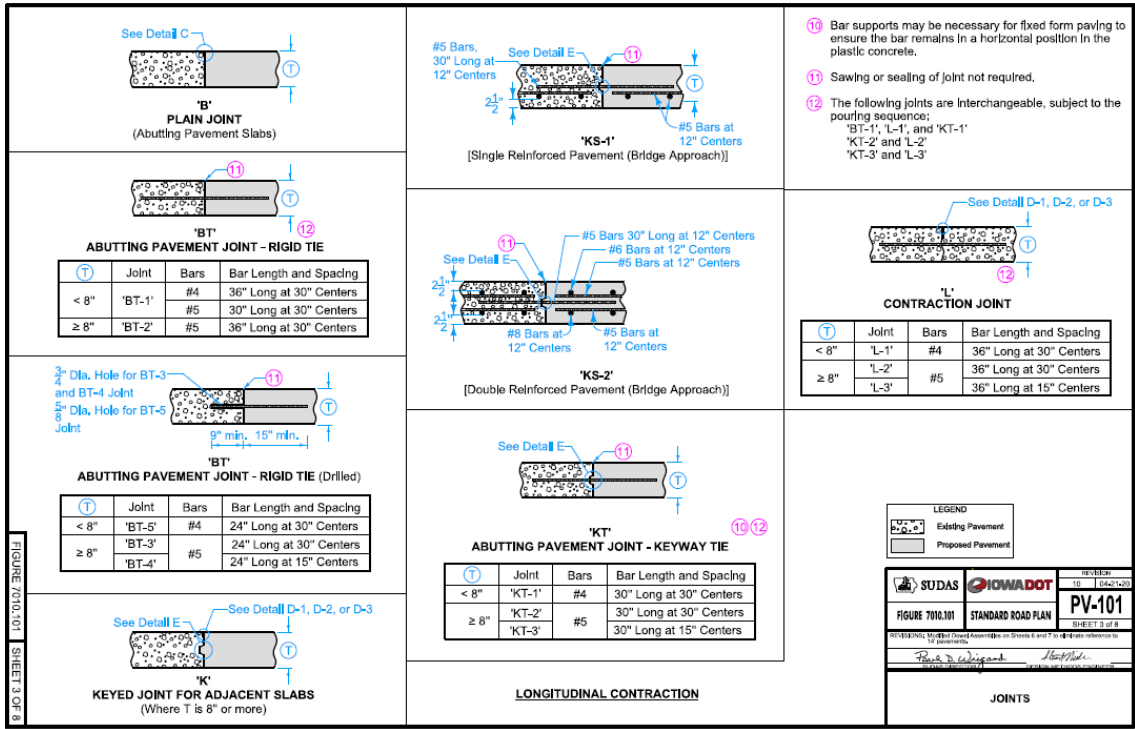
Longitudinal contraction joint design layout (Iowa DOT 2020).
